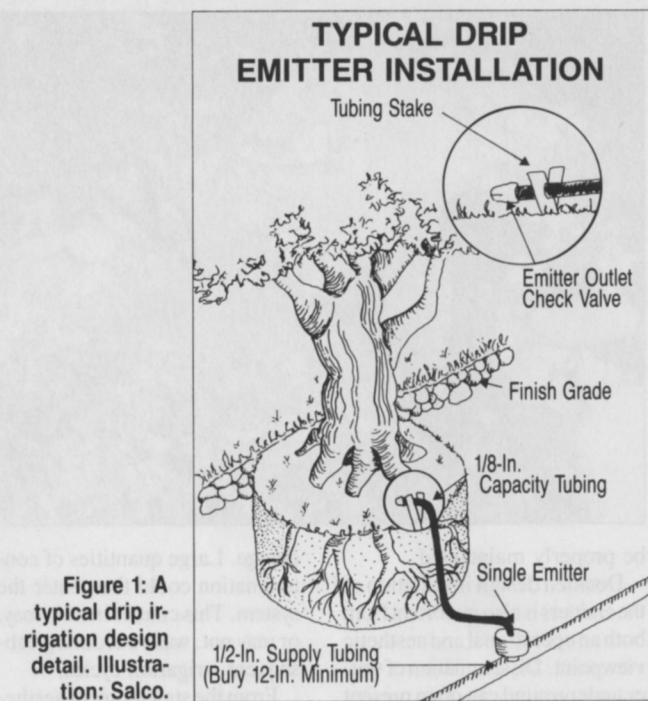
A typical drip irrigation design detail. Illustration: Salco.
